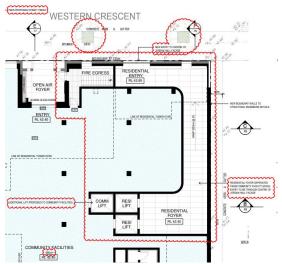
Extract of Ground Floor plan, indicating new residential entry off Western Crescent (Source: Innovate Architects)
